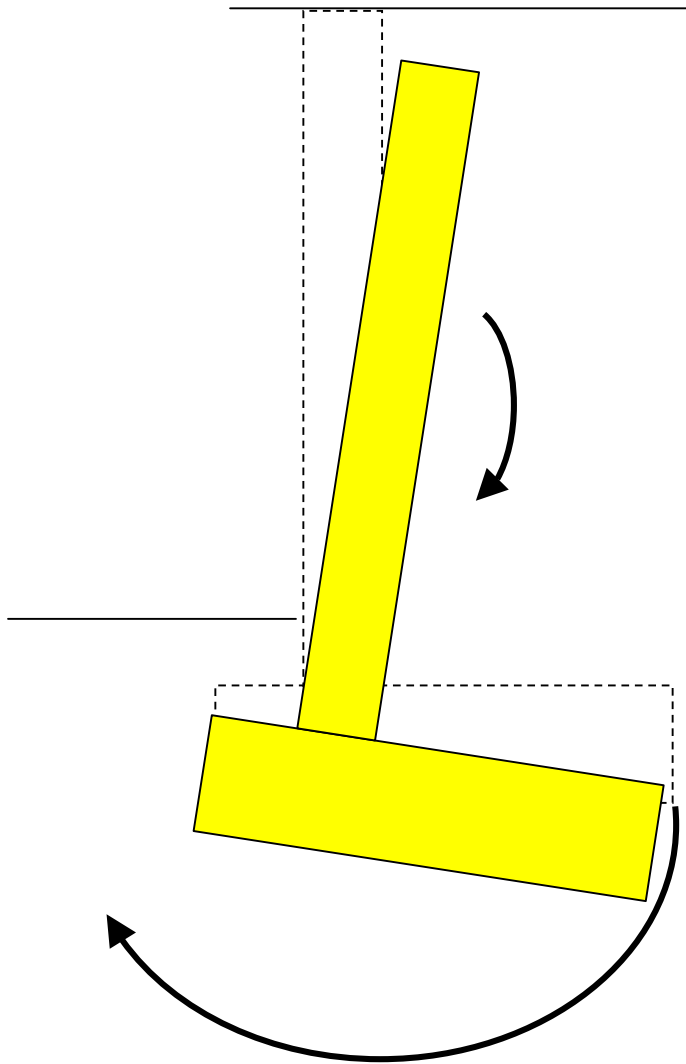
Bearing Capacity Failure of Cantilever Retaining Wall
